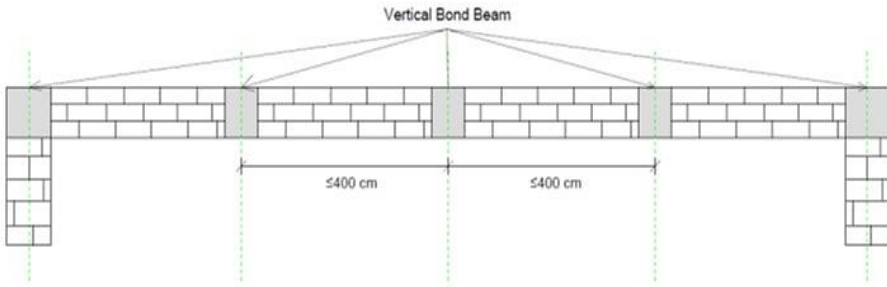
Management of vertical bonding beams within the layout. Adapted from [30]
